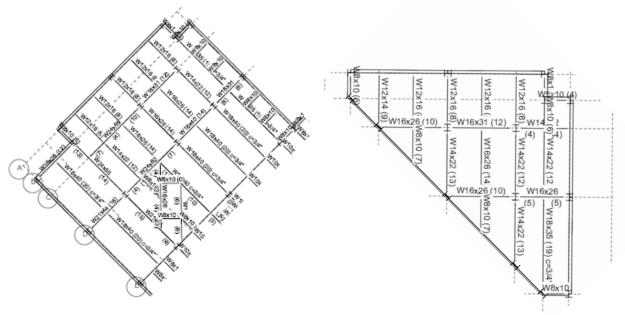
Existing Framing Sections (Floor on left, Wing on right)
